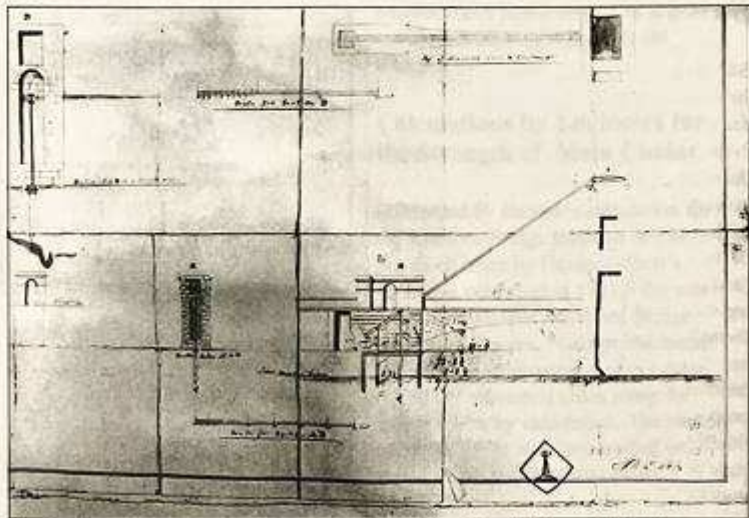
Union Bridge anchorage and tower details c. 1819⁴³. (National Library of Scotland)
